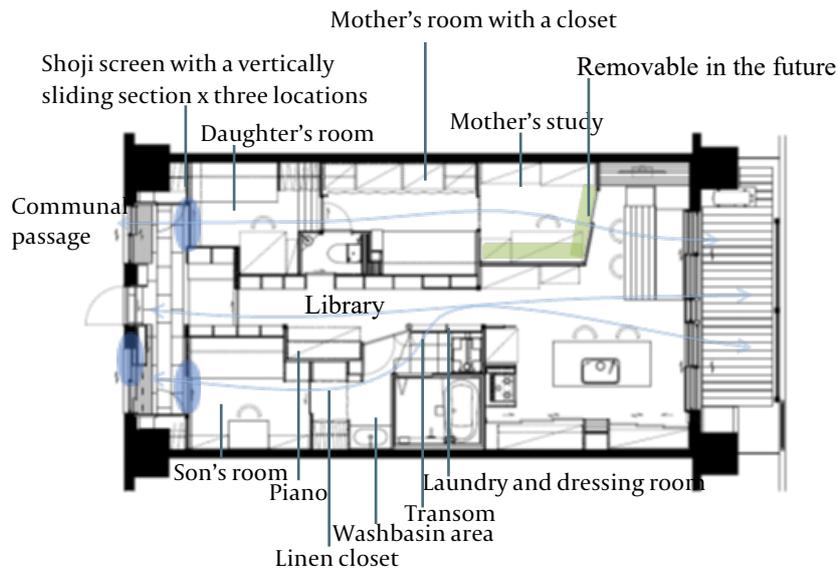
Floor plan of Nakagyo Kaze-no-ya.
